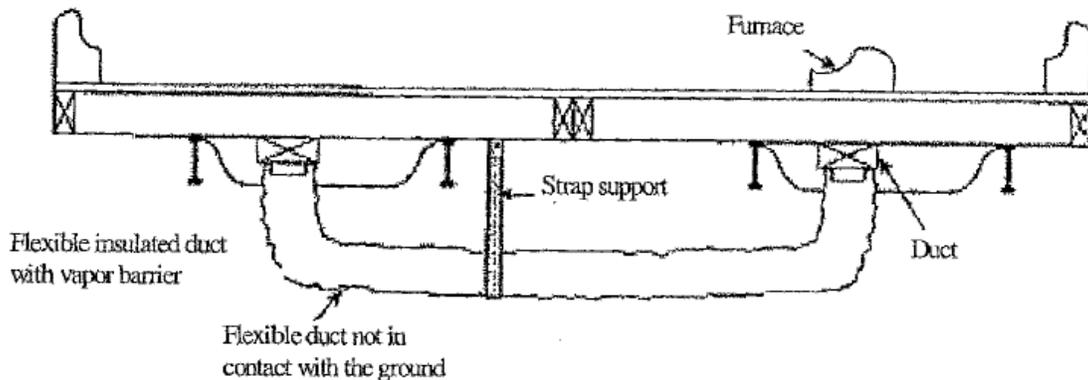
Crossover Duct Installation with Two Connecting Ducts.
